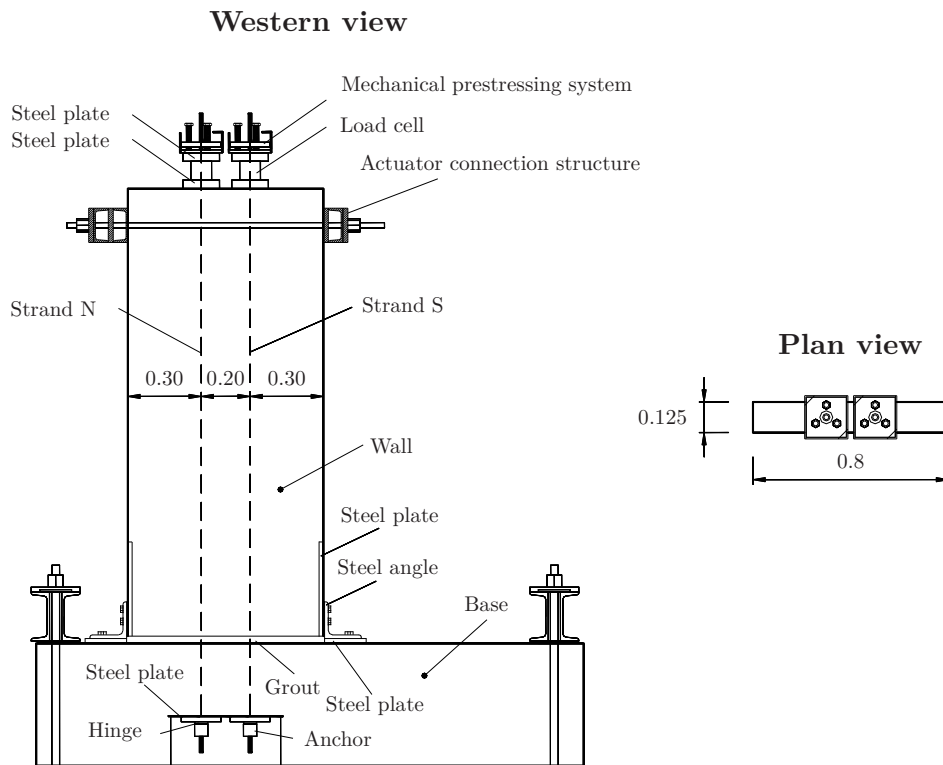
Western and plan views of wall specimen RM4 test setup.
